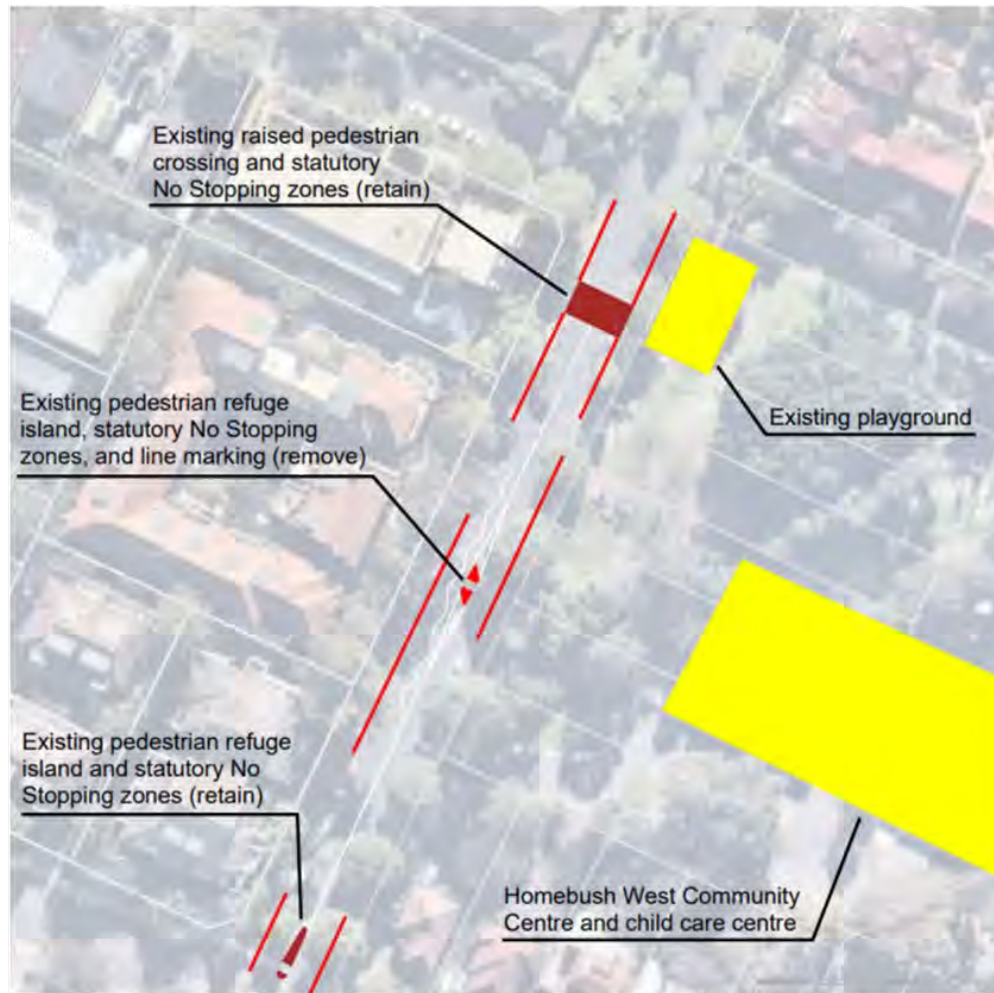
existing traffic devices, parking restrictions, and attractors and generators around Hampstead Road between Tavistock Road and Arthur Street
